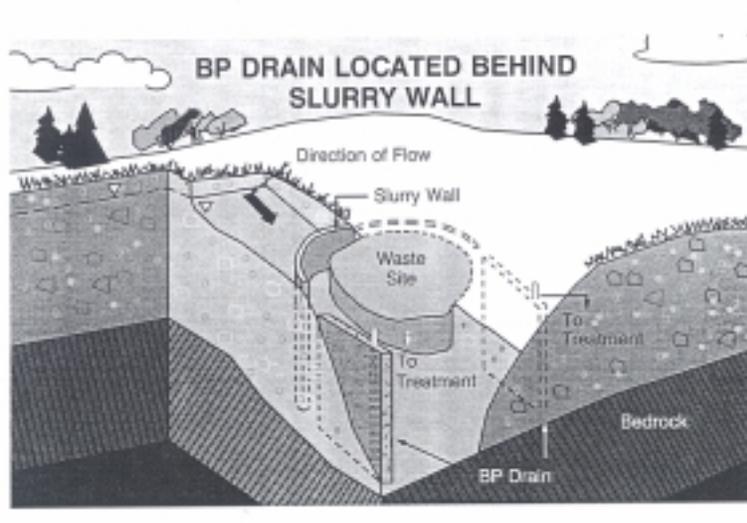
Schematic of Slurry Wall and Bio-Polymer System to Dewater Landfill
